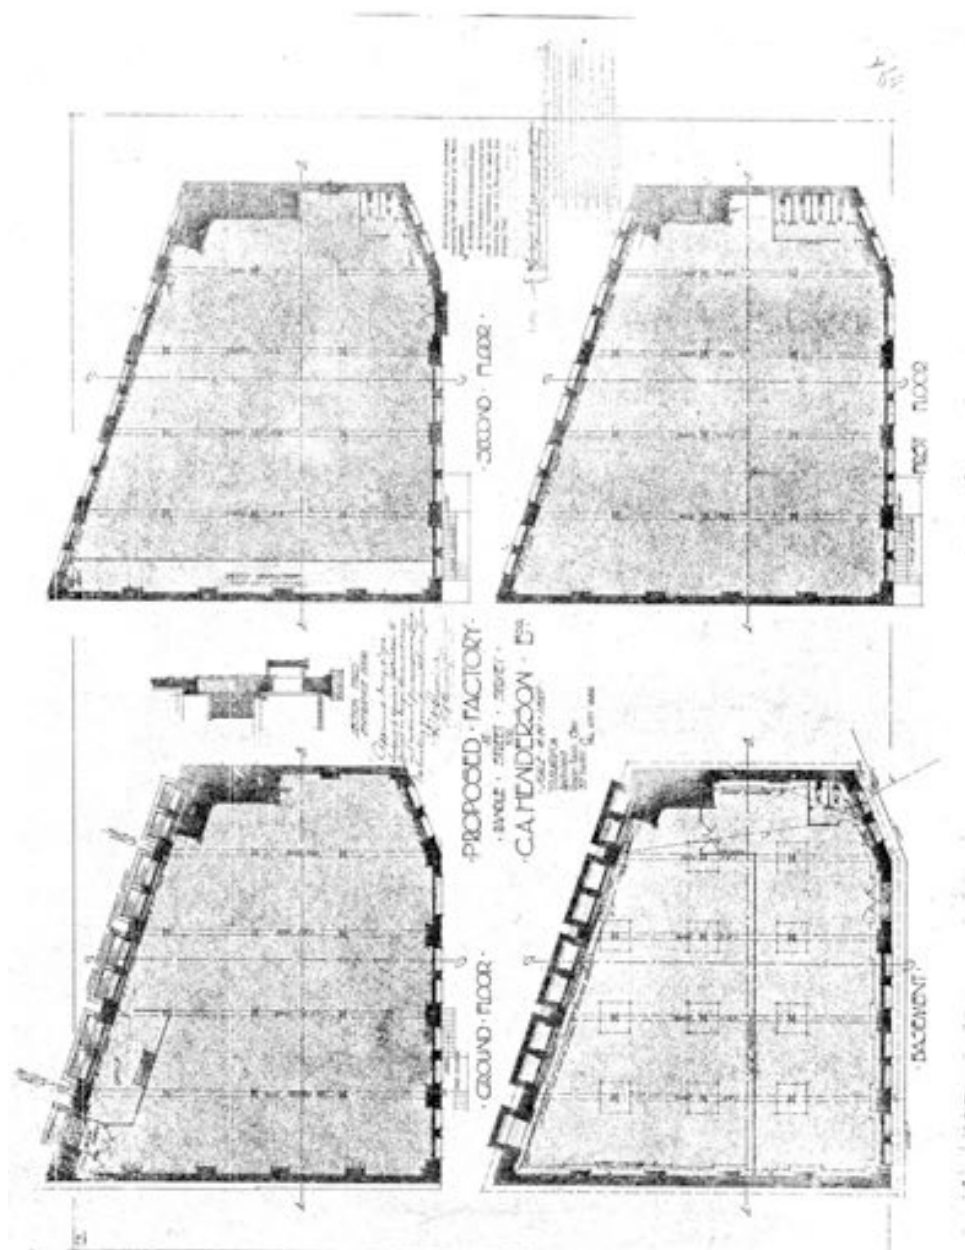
Plans of floors basement to second of the factory as designed in 1912 (architect TP Sampson) for RC Henderson's hat factory
